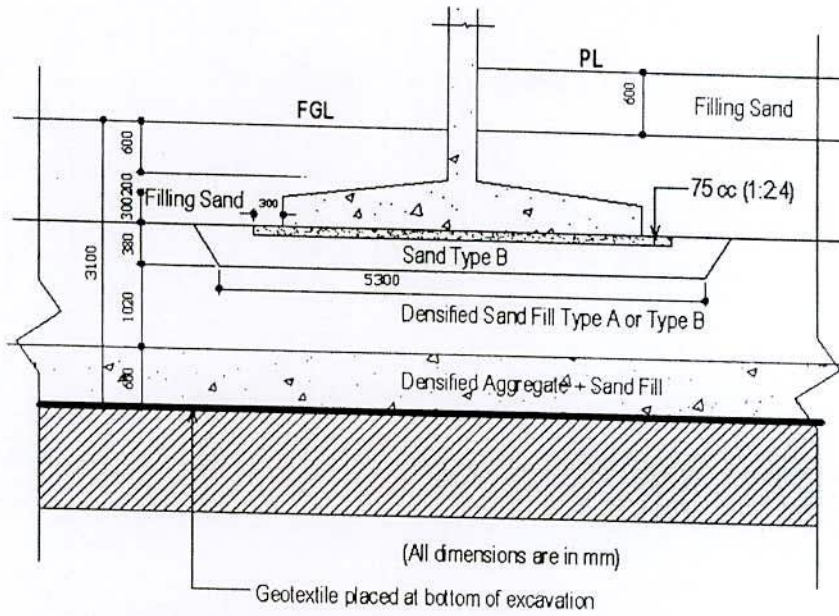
Detail of column footing on mattress (after Kabir et al., 1997).
